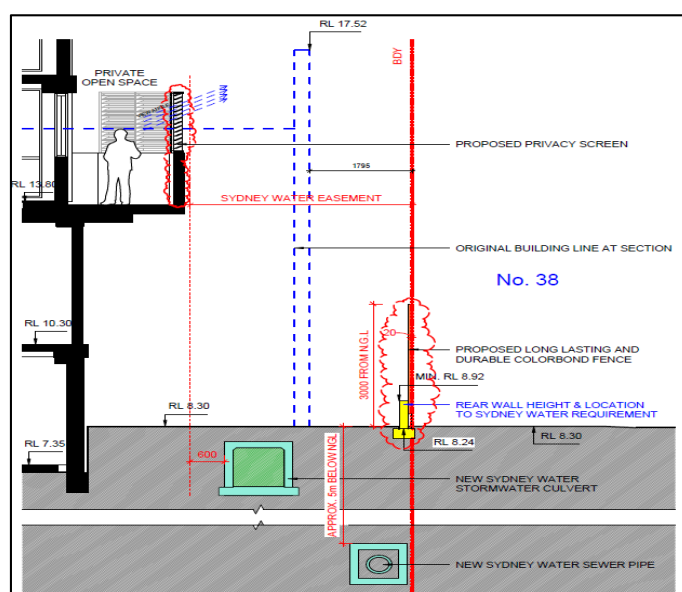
Type A fence along the southern boundary (section view adjoining 38 Miles Street)
